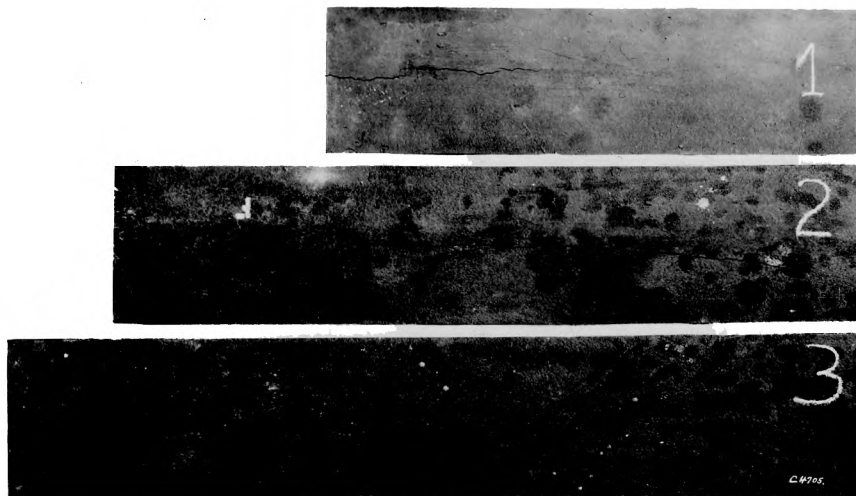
Cracks in Asphalt Planks Caused by Improper Crating and Rough Handling.
